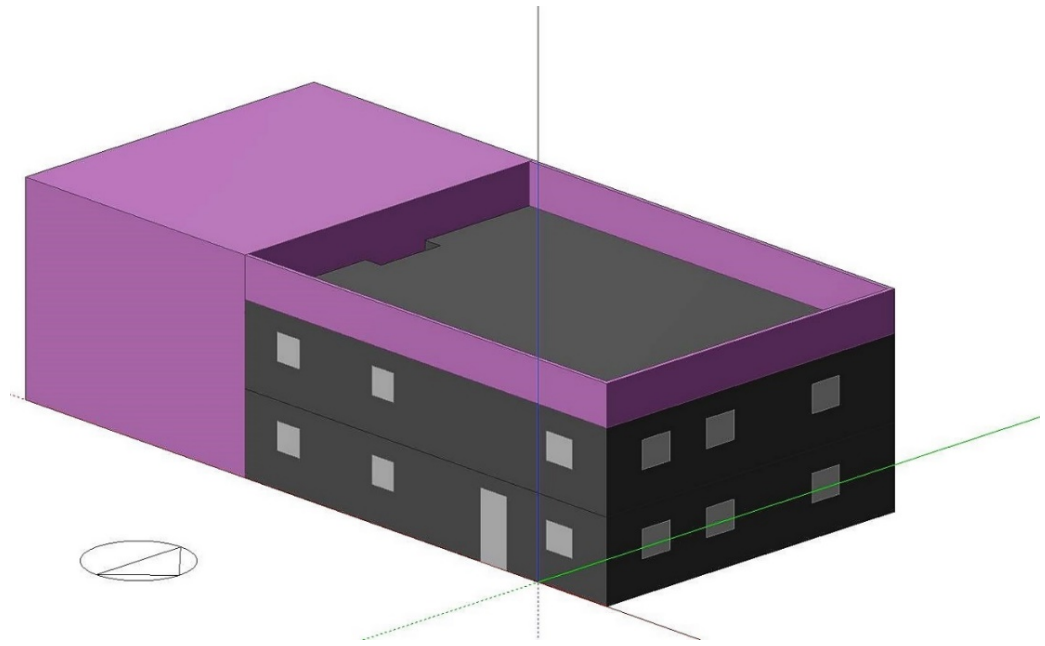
The plan and geometric description of the House 1 (ground floor)
